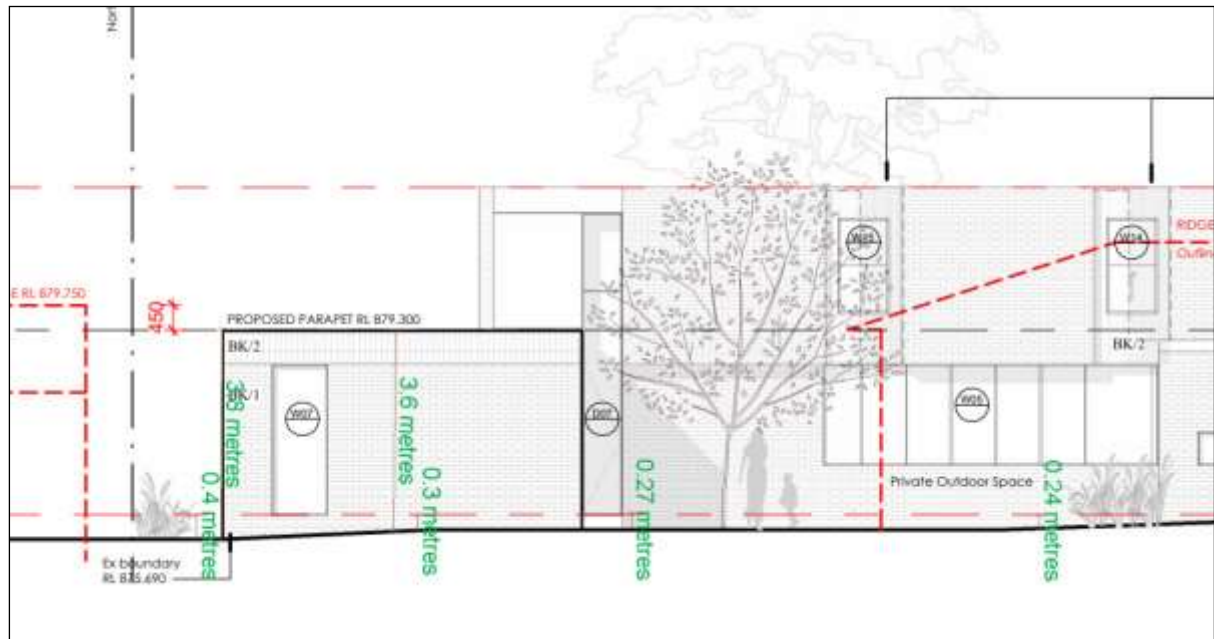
natural ground level (black line) and proposed finished floor level (red line)
